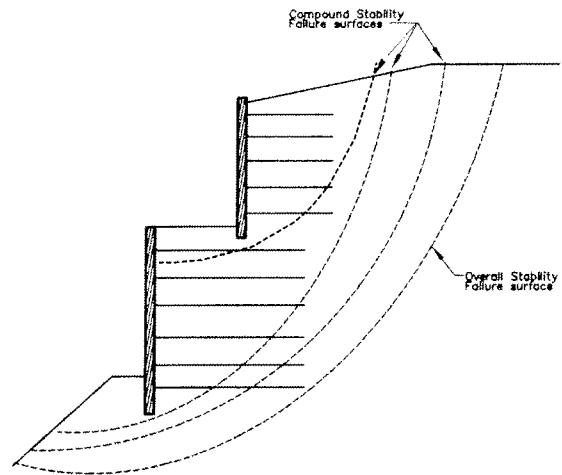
Overall and Compound Stability of Complex MSE Wall Systems.
